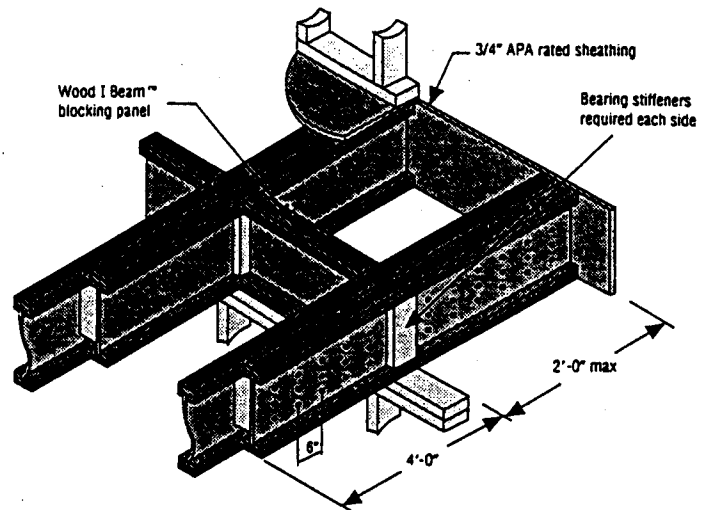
CONTINUED – NON-LOAD BEARING CANTILEVER DETAILS
